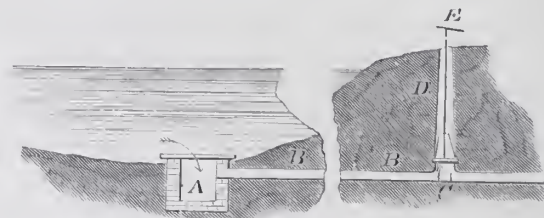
SECTIONAL VIEW OF OUTLET AT CEDAR HILL CEMETERY.
